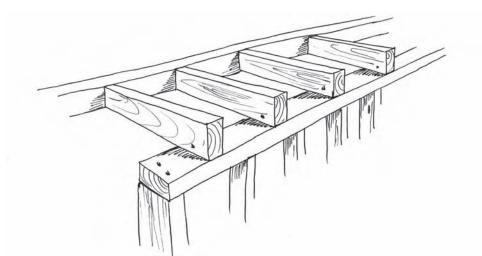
Installation of jack joists from the ceiling joist to the top of a parallel wall
